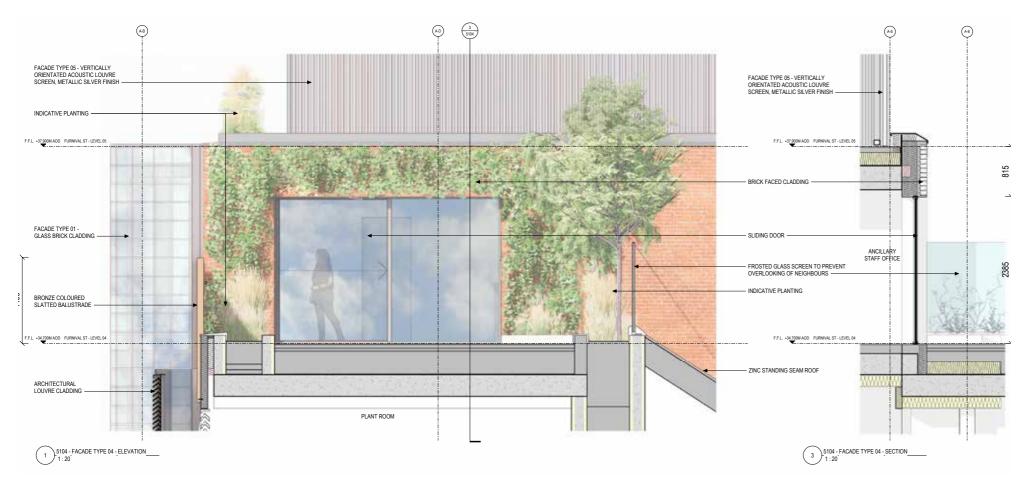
40-41 Furnival Street Glass Block Facade - L3 Plant and L4 Office
